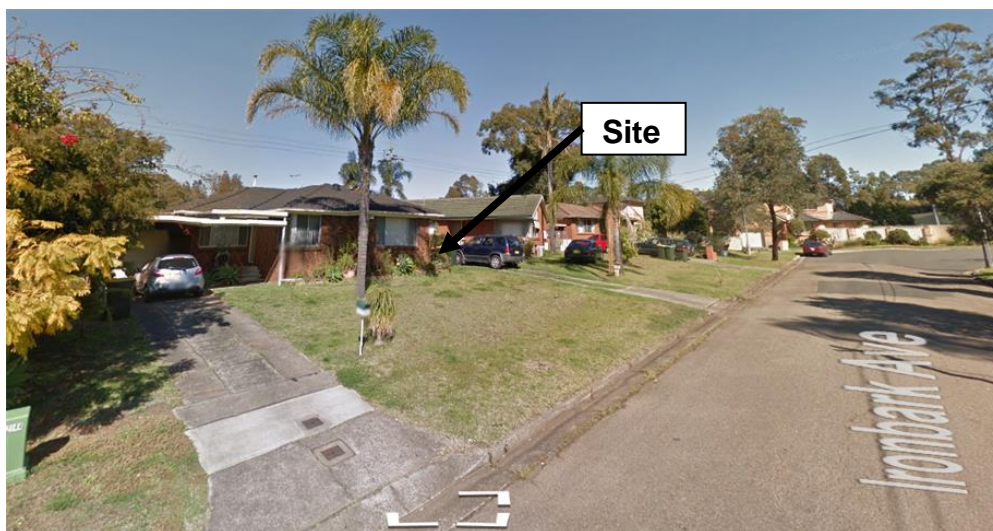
Front view of site from 30 Ironbark Avenue looking west.
